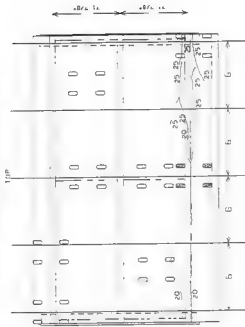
Top Cracking Pattern (Third Bridge - Test No 2)
